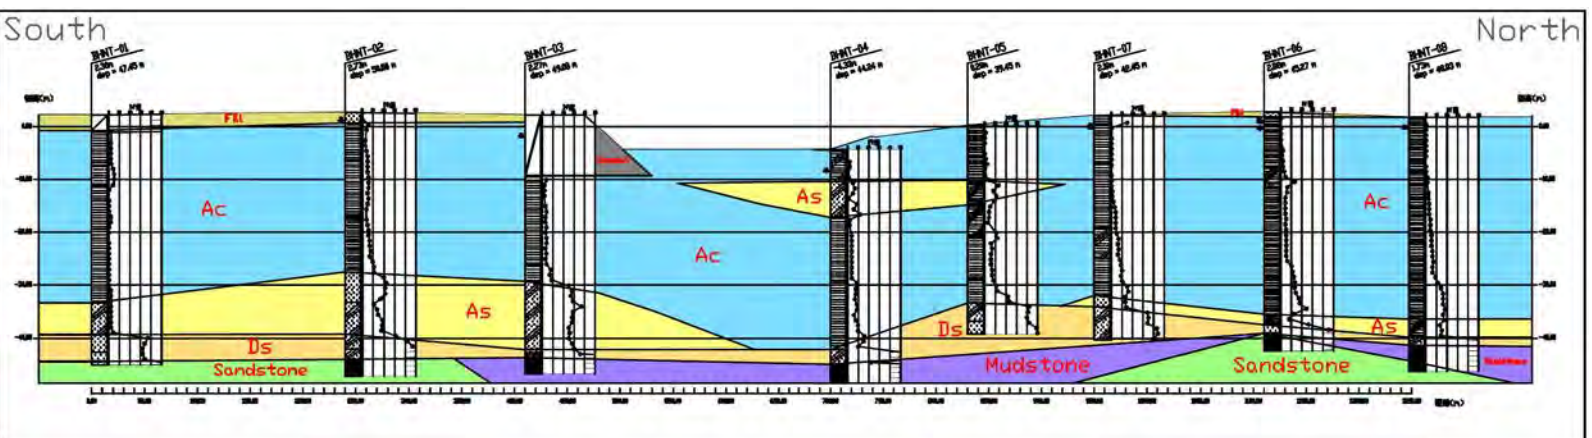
Soil Profile for Nguyen Trai Bridge Site
